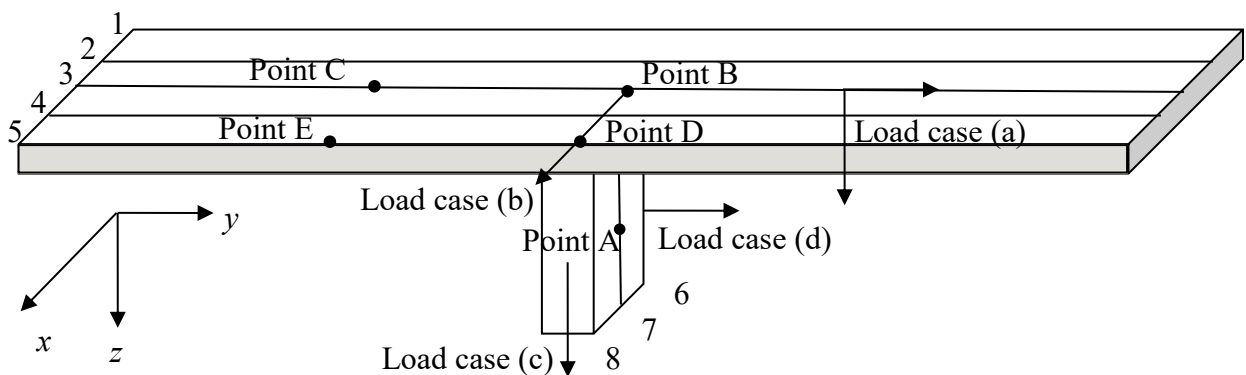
FSM model and load cases and test points of the slab-girder bridge (Adapted from Shen et al. 2013)
